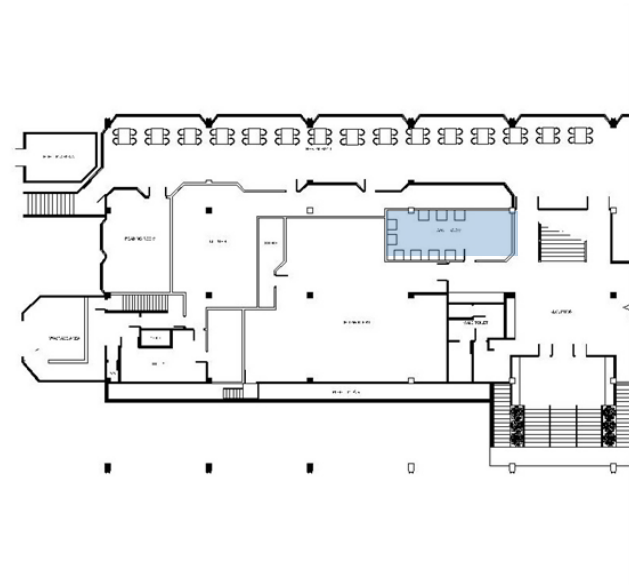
(ag): Layout of highlighted ground floor plan (Lim,2017)
